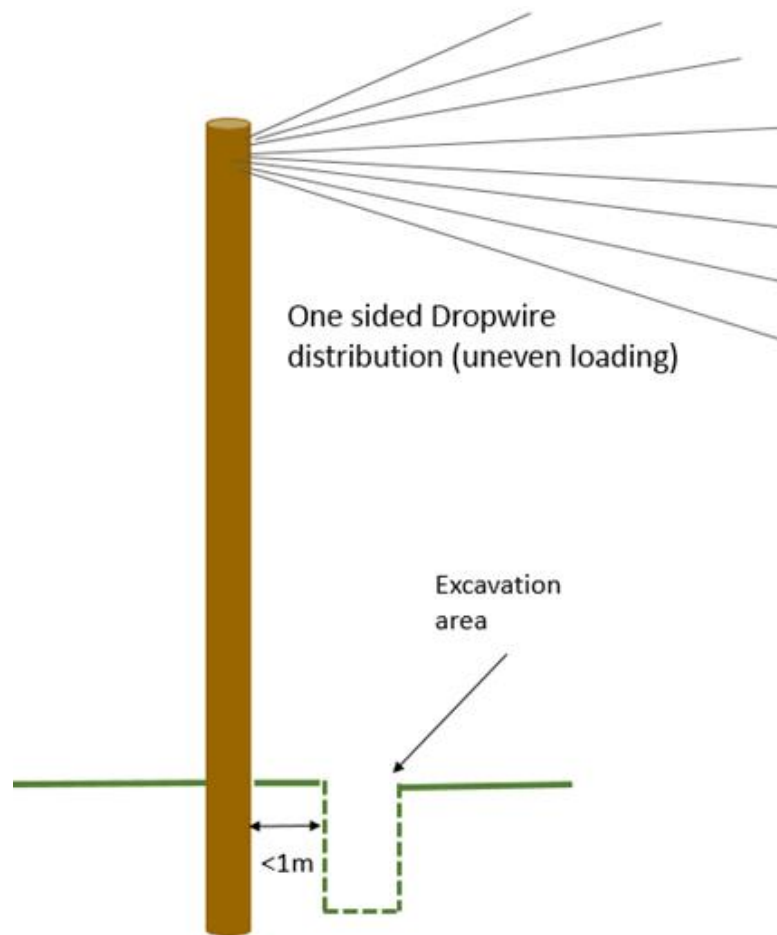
Sideway loaded Pole, excavation ( $r/h$ )  $< 1m$
